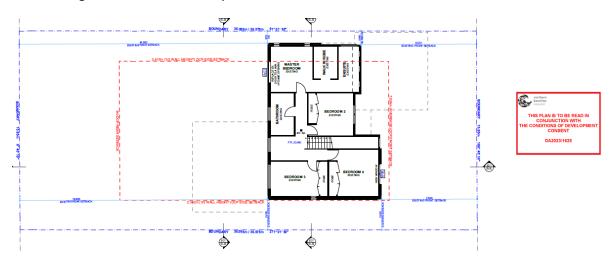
Extract from Stamped Approved Plans Drawing Proposed First Floor Plan (DA09)
